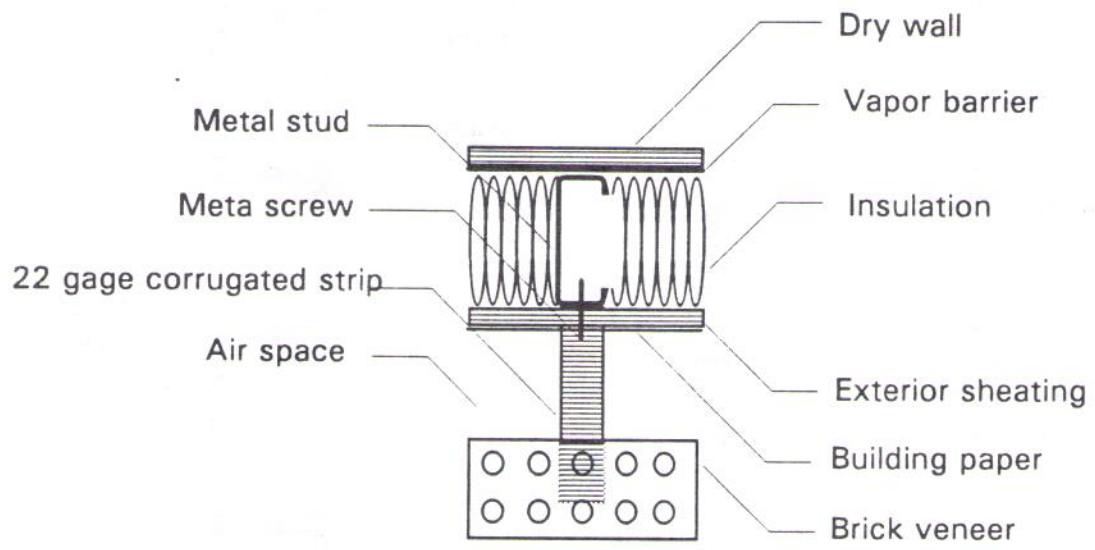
Typical cross section of brick veneer-steel stud wall system of the 1970's and early 1980's.
